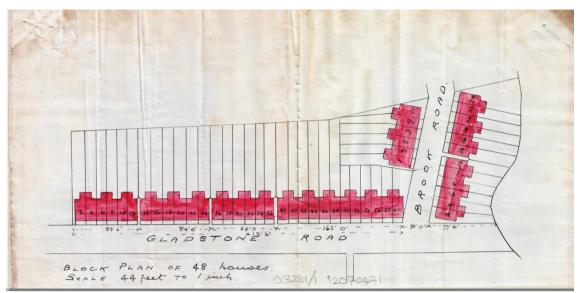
Block plan for a larger application of 48 houses, prepared by local surveyor Ernest Pennington, 1898 (Richmond Local Archive, PLA/03468)
